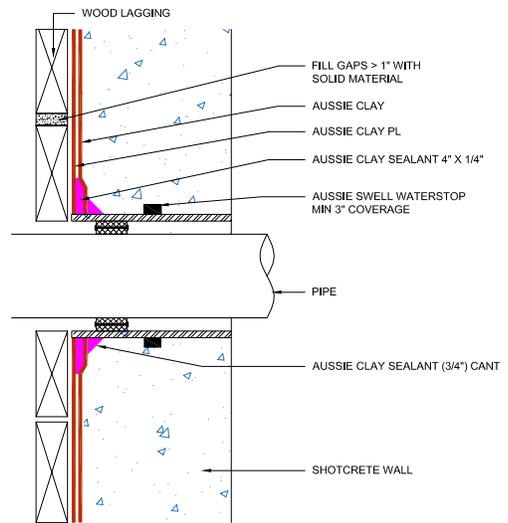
SLEEVED PIPE PENETRATION IN HYDROSTATIC SHOTCRETE CONDITION
